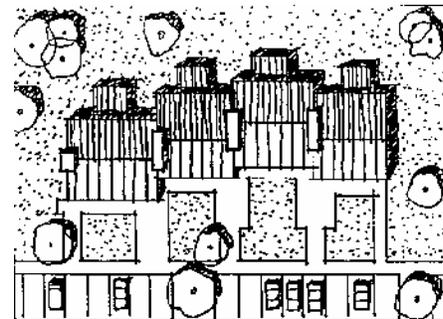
Plan and elevation views illustrating design criteria for multi-family units.
